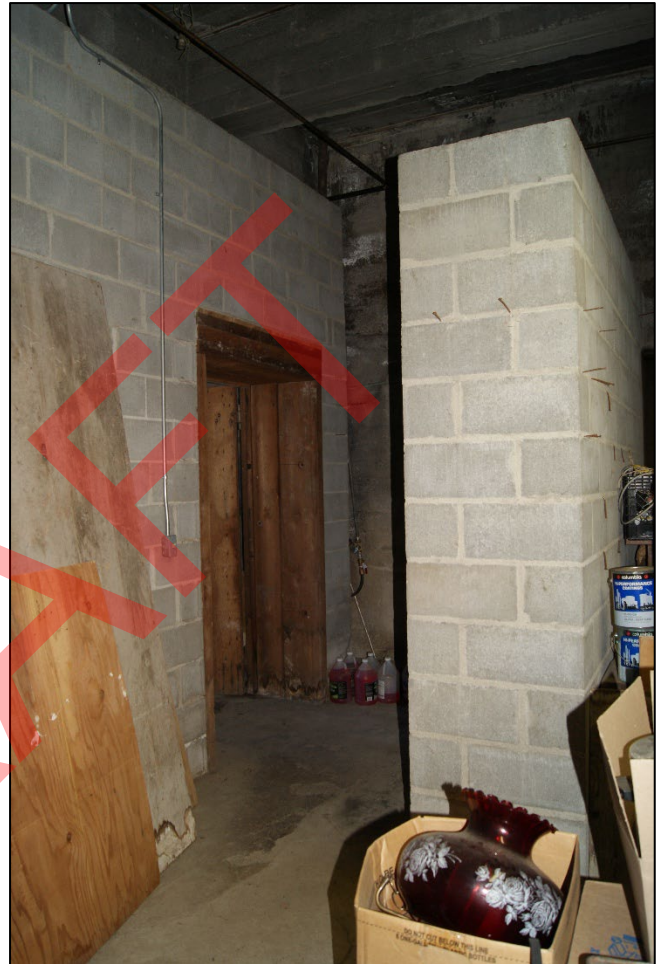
Steam Plant (resource 2) basement, new CMU interior wall, view north. 2025.
